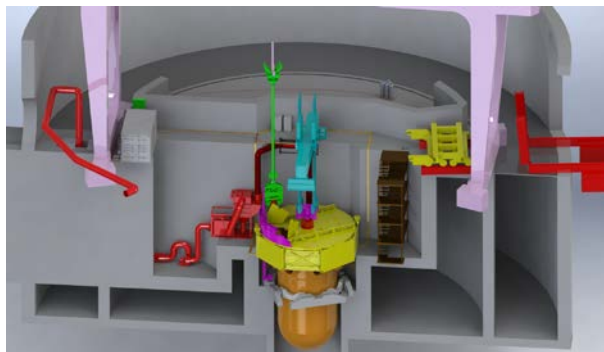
3D-view of the installation plan for the RPV Segmentation equipment
